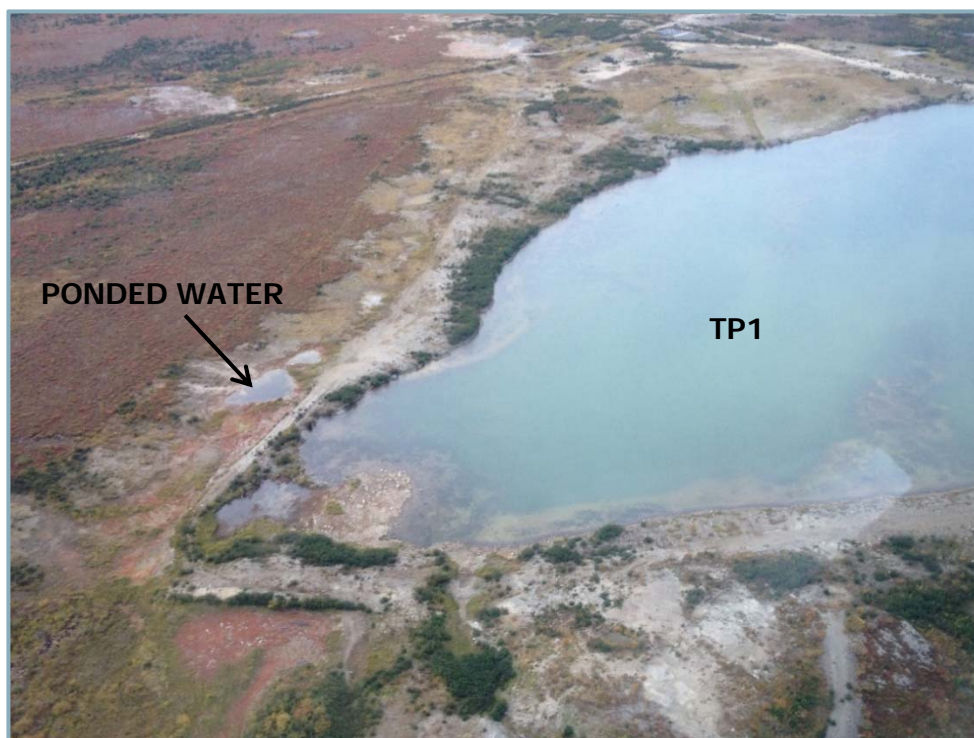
Minor ponding and small areas of exposed tailings in TP1 (looking west).
